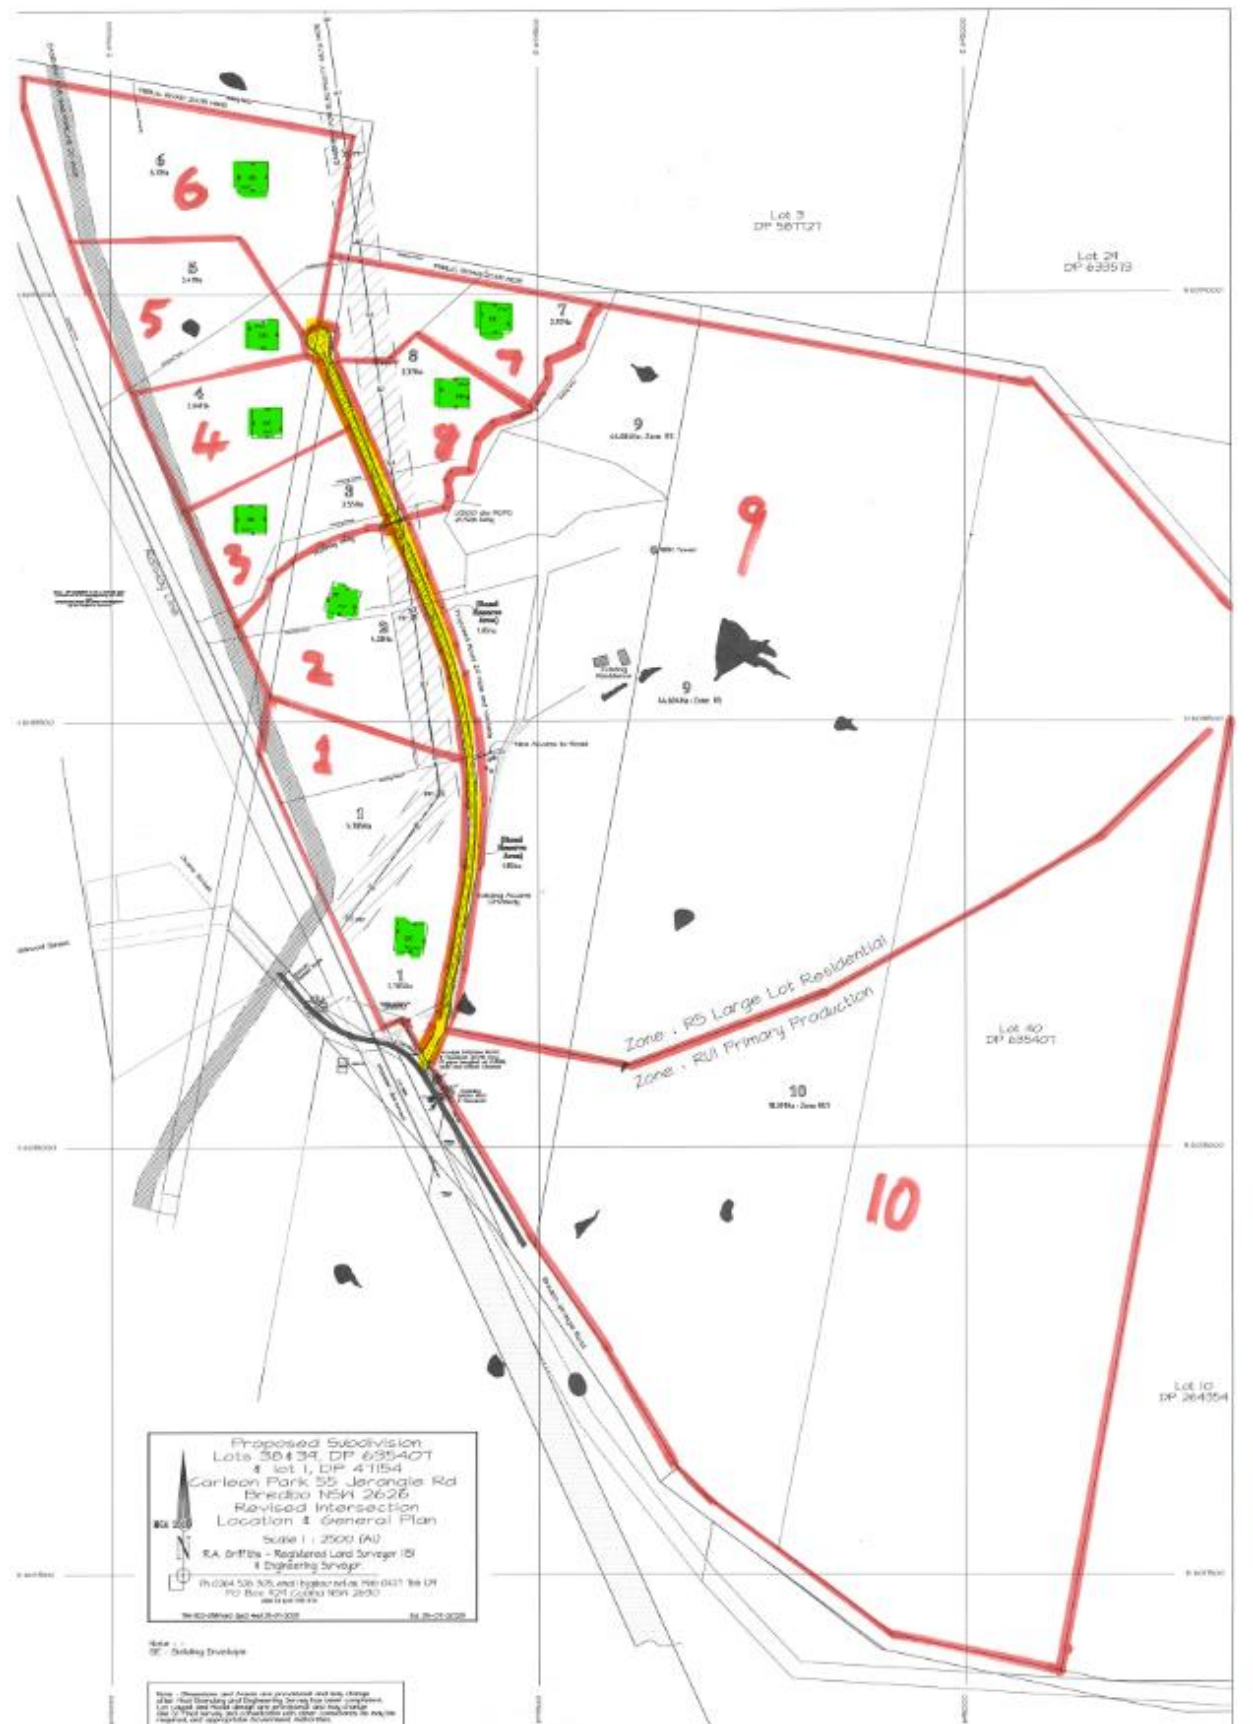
Proposed subdivision plan. Lot boundaries marked in red. Proposed public road marked in yellow. Proposed building envelopes on lots 1-9 coloured green.
